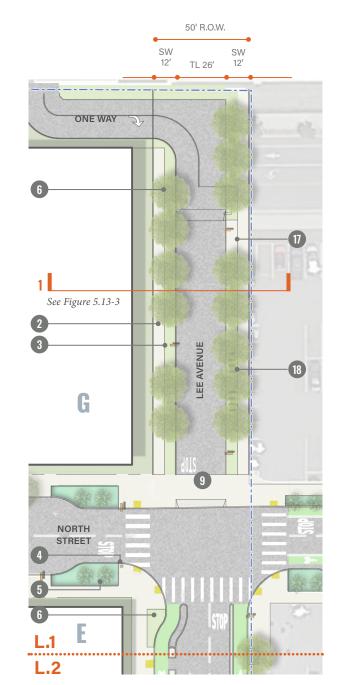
Lee Avenue, Site Plan Enlargement L.1
